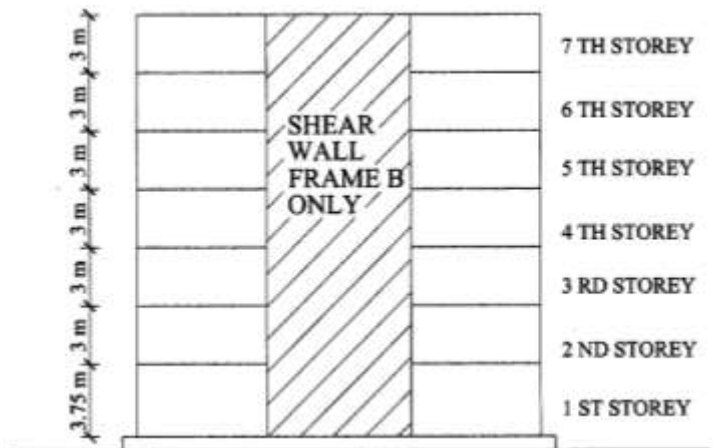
General Elevation of Seven Story Building (SP-84, 1985)
